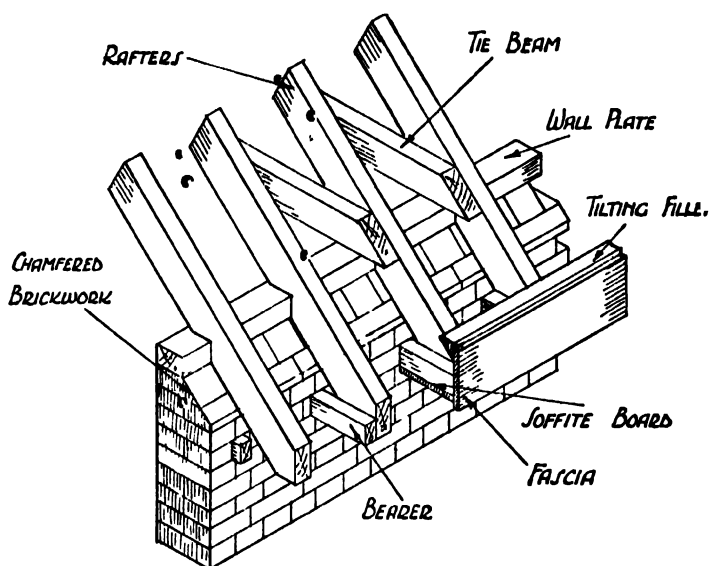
PITCHED ROOF - EAVES CONSTRUCTION
